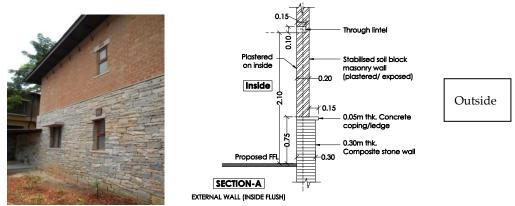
Compressed Stabilized Earth Block & Random Rubble Masonry Wall
